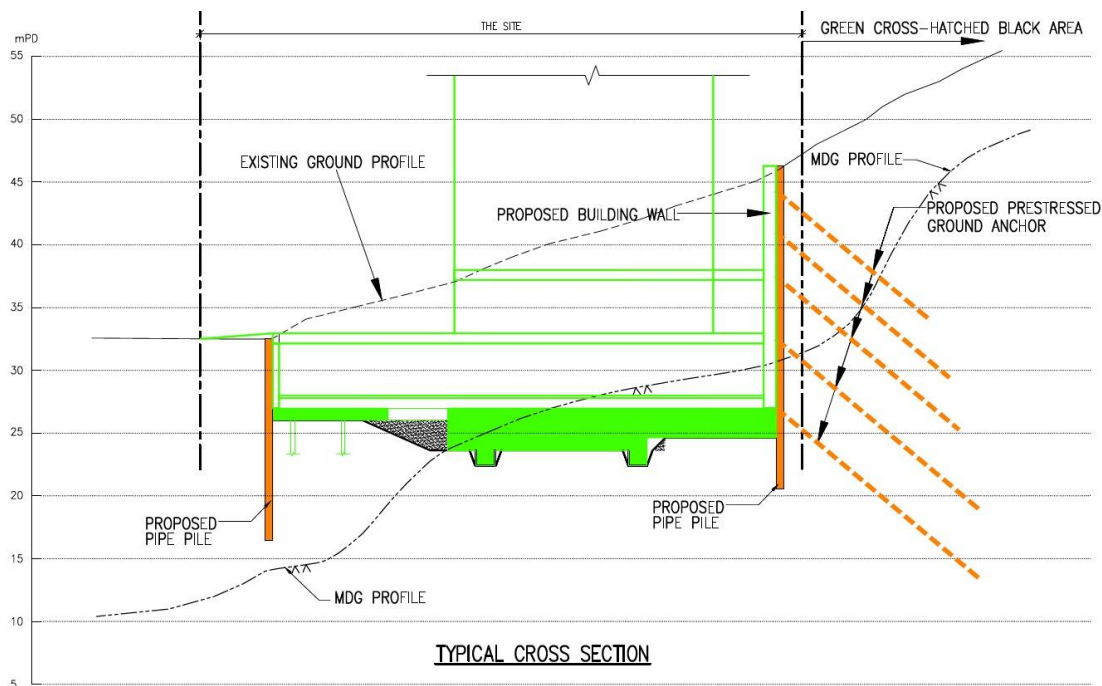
A Typical Cross Section of Tie Back Excavation of a Site in Tsing Yi
